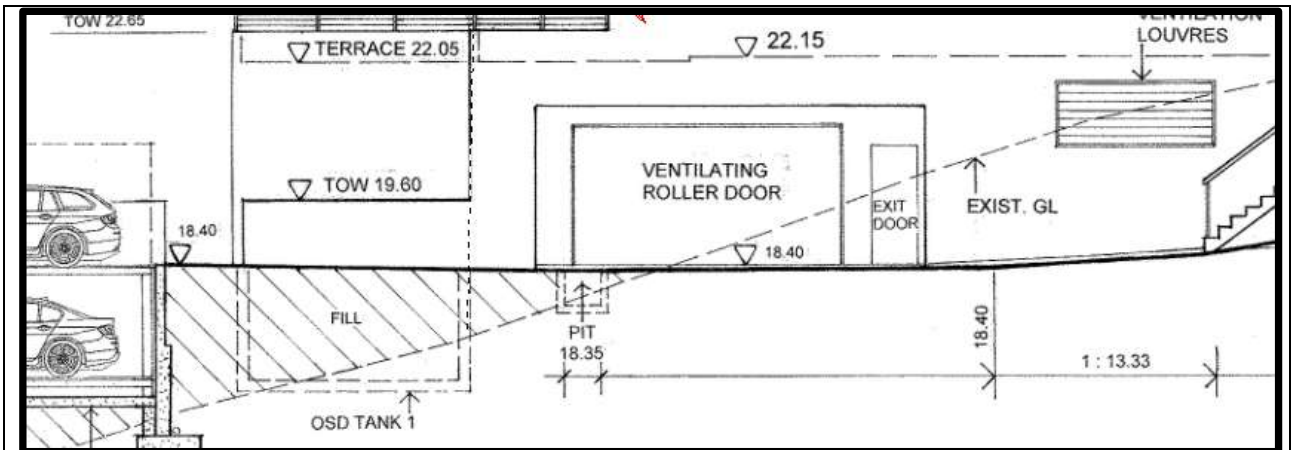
Extract of rear site plan of Units 5-6 (Source: Bo Design, 18) (Note - diagram reorientated to be consistent with site plan)
